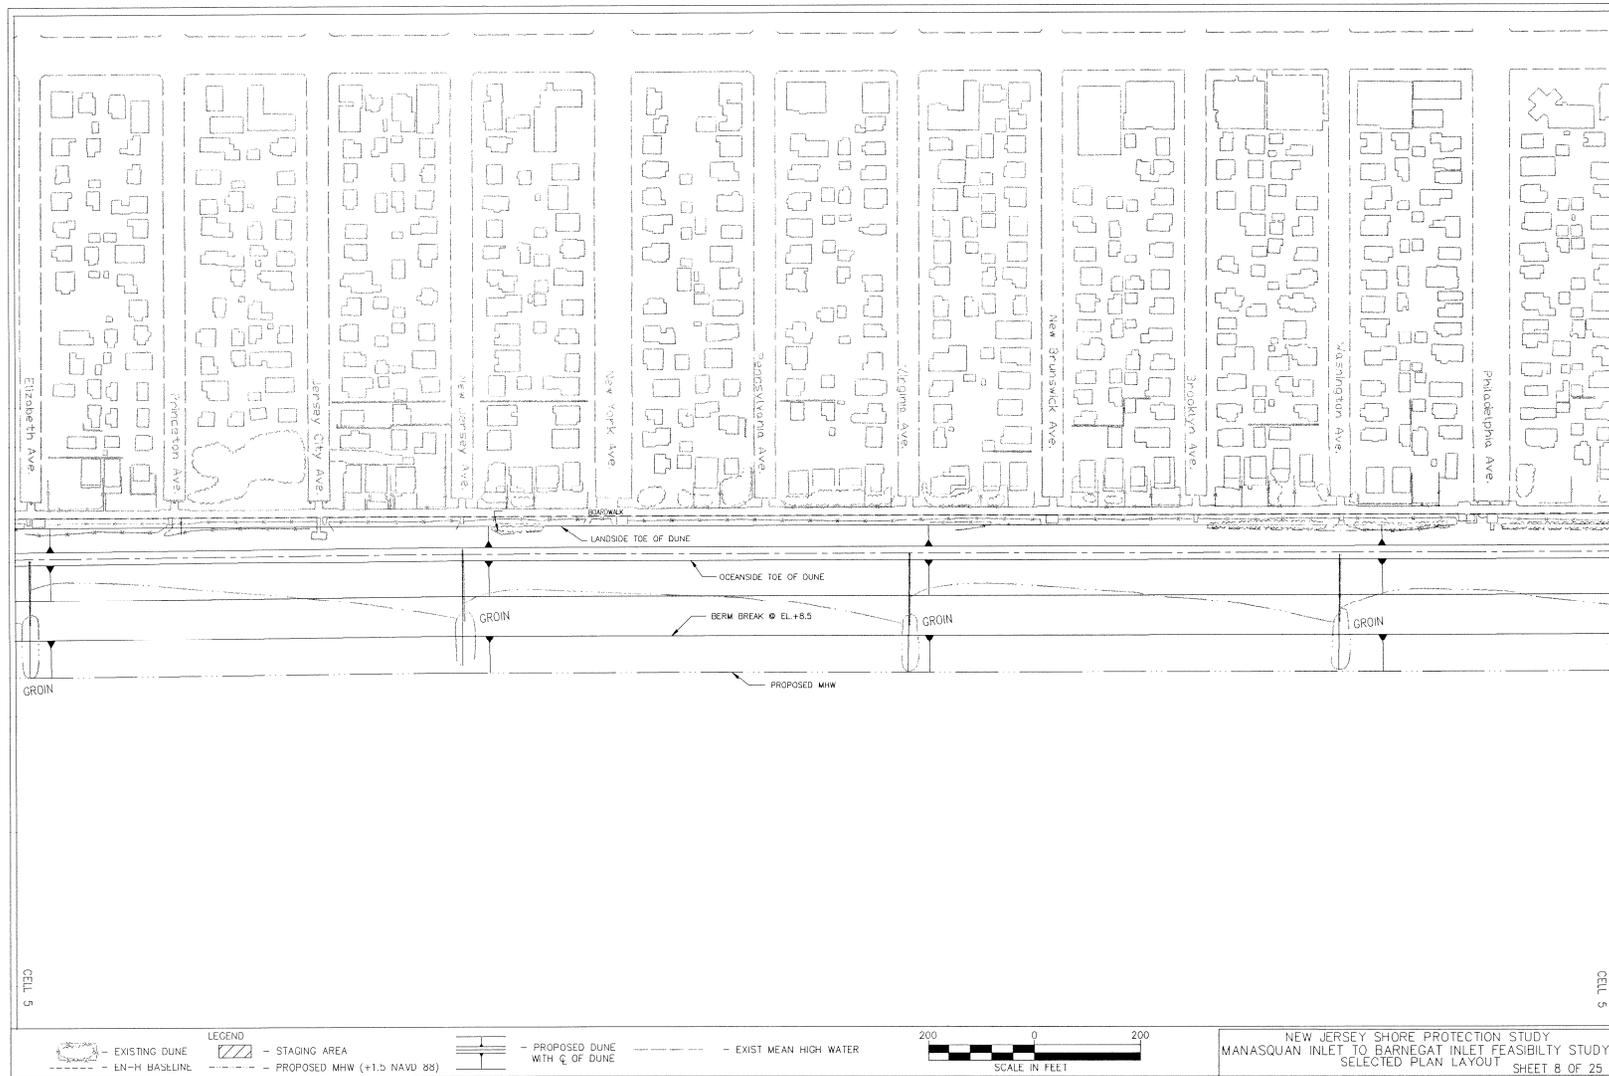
Selected Plan Layout – Lavallette Borough, Elizabeth Avenue to Philadelphia Avenue
